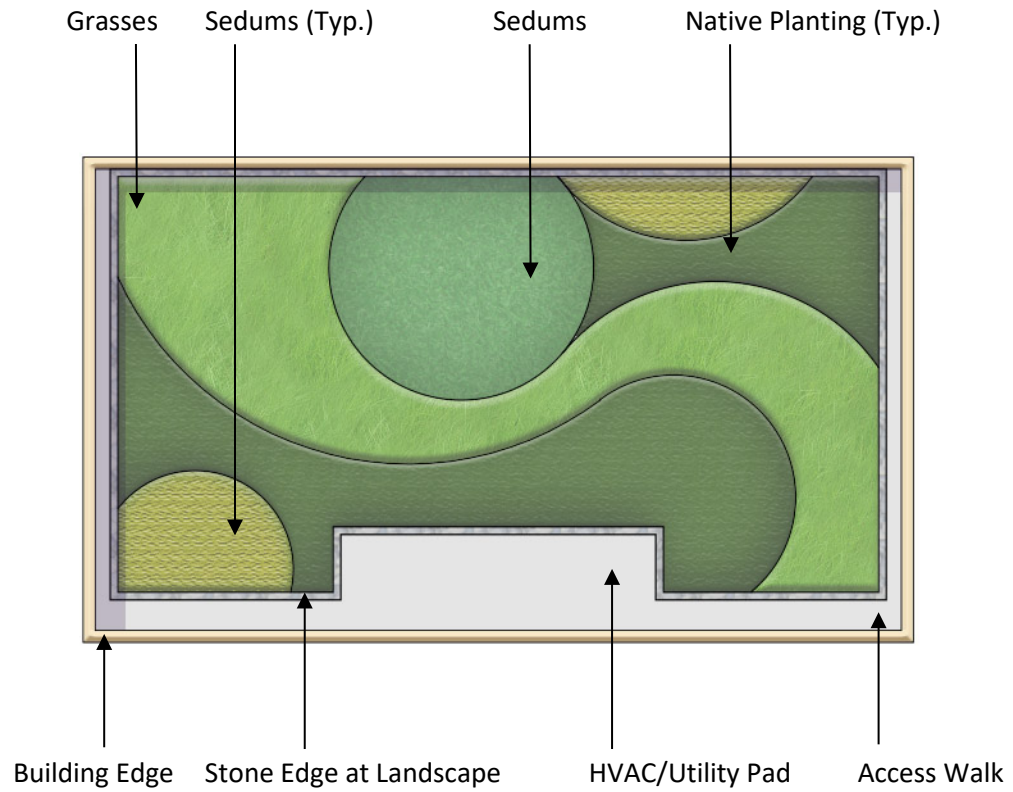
Sample schematic design of a 20,000-SF extensive vegetated roof.
